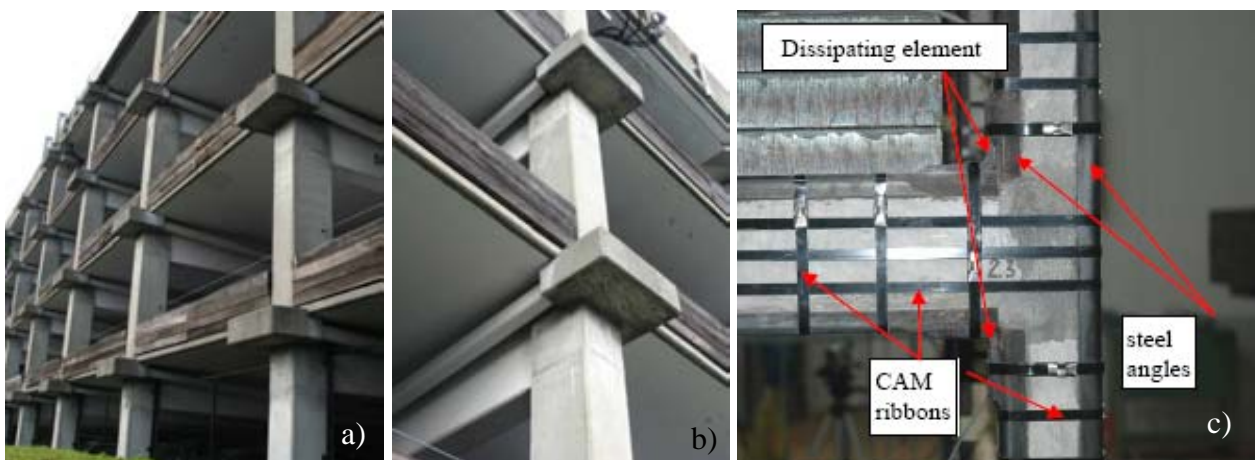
External post-tensioning retrofit solutions for RC frames: a-b) Gravity-load strengthening of parking structure (described in ref. [1]); c) DIS-CAM prestressed beam-column joint retrofit [49].
